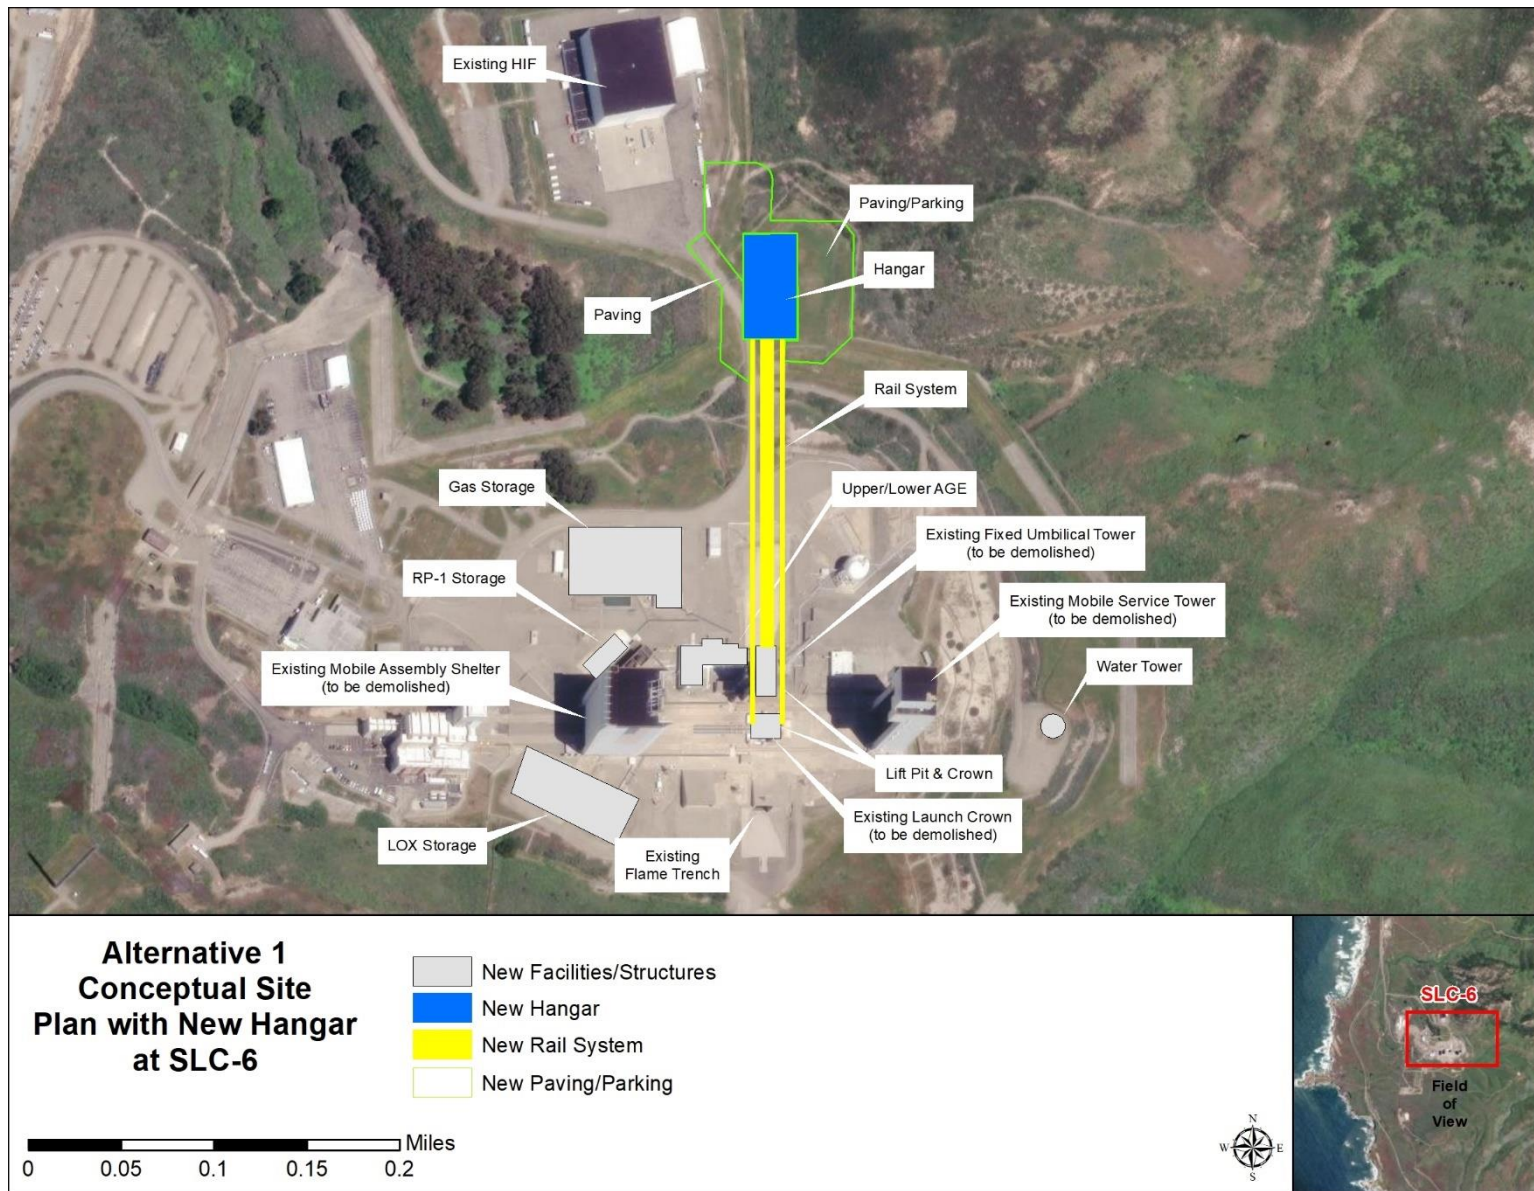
Alternative 1 – New Hangar at SLC-6
